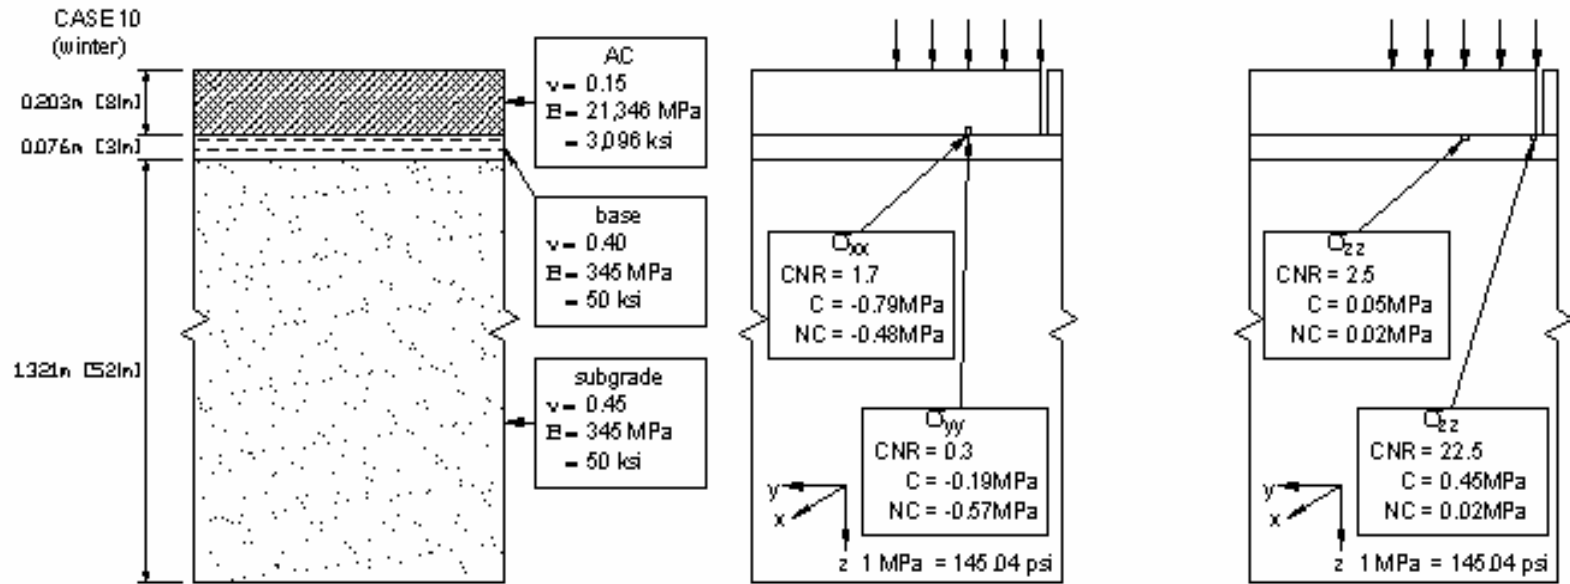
Summary cross section for case 10, (C – stress in cracked pavement, NC – stress in pavement with no crack, CNR – crack/no crack (stress) ratio)
